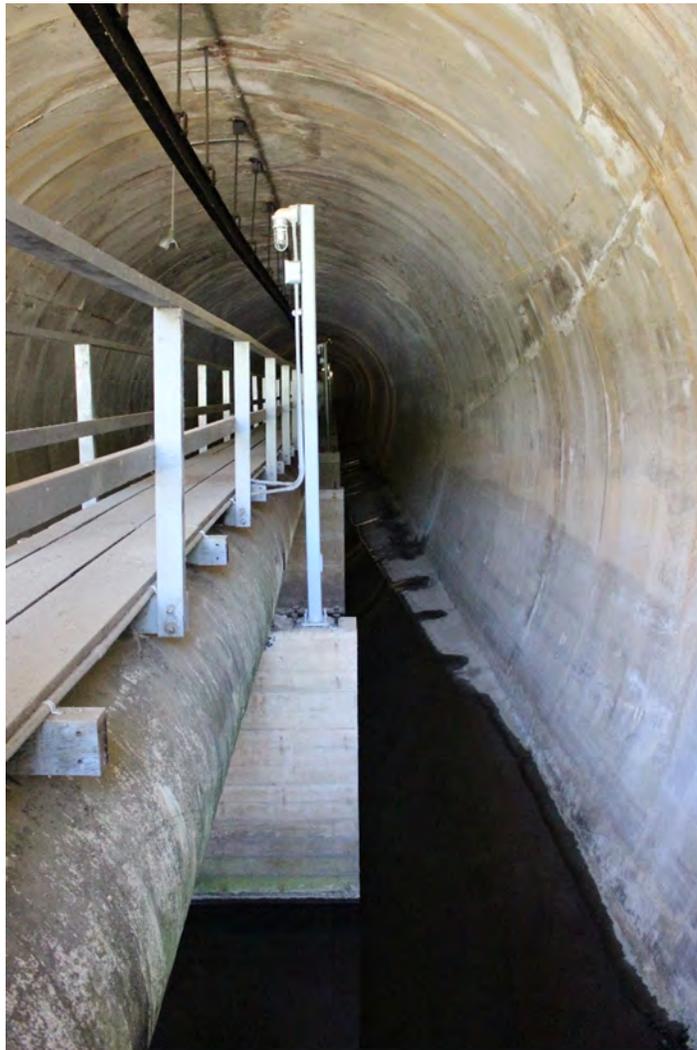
Diversion tunnel with El Capitan Pipeline below concourse, metal and concrete supports visible below (IMG\_2009)
